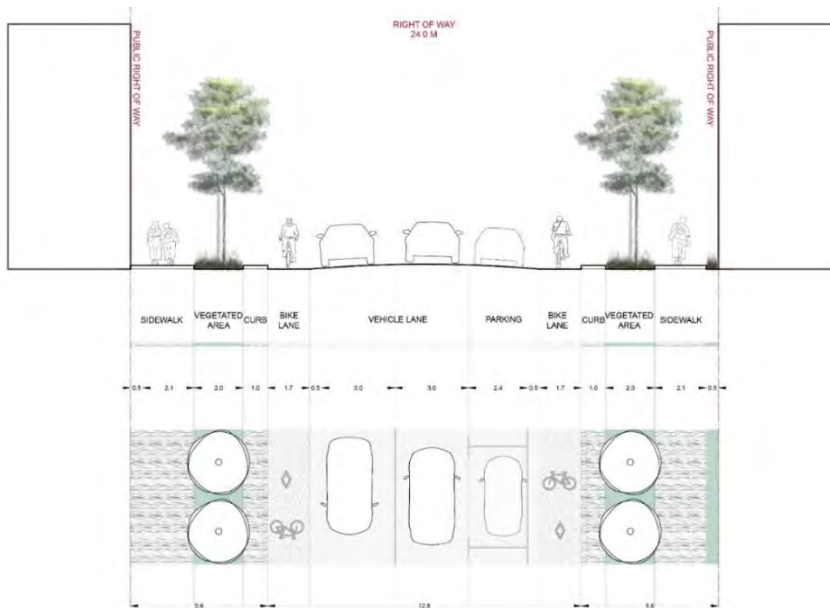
Existing Downtown Complete Street Cross-Section
